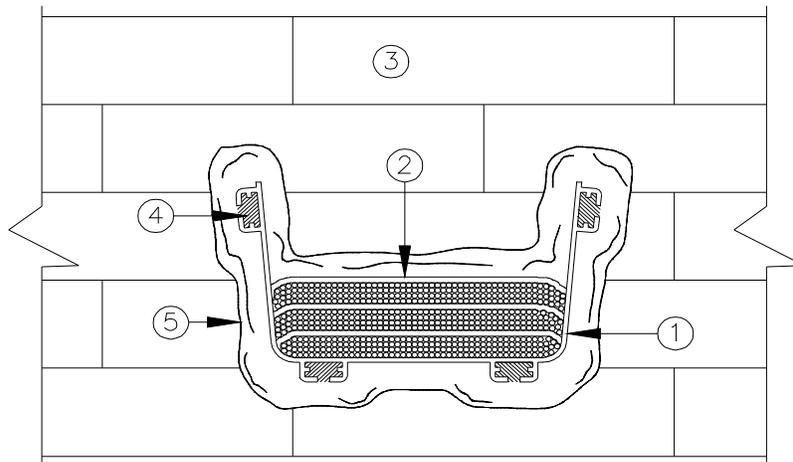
FIRE STOPPING NON-METALLIC PIPE AND TUBING IN
